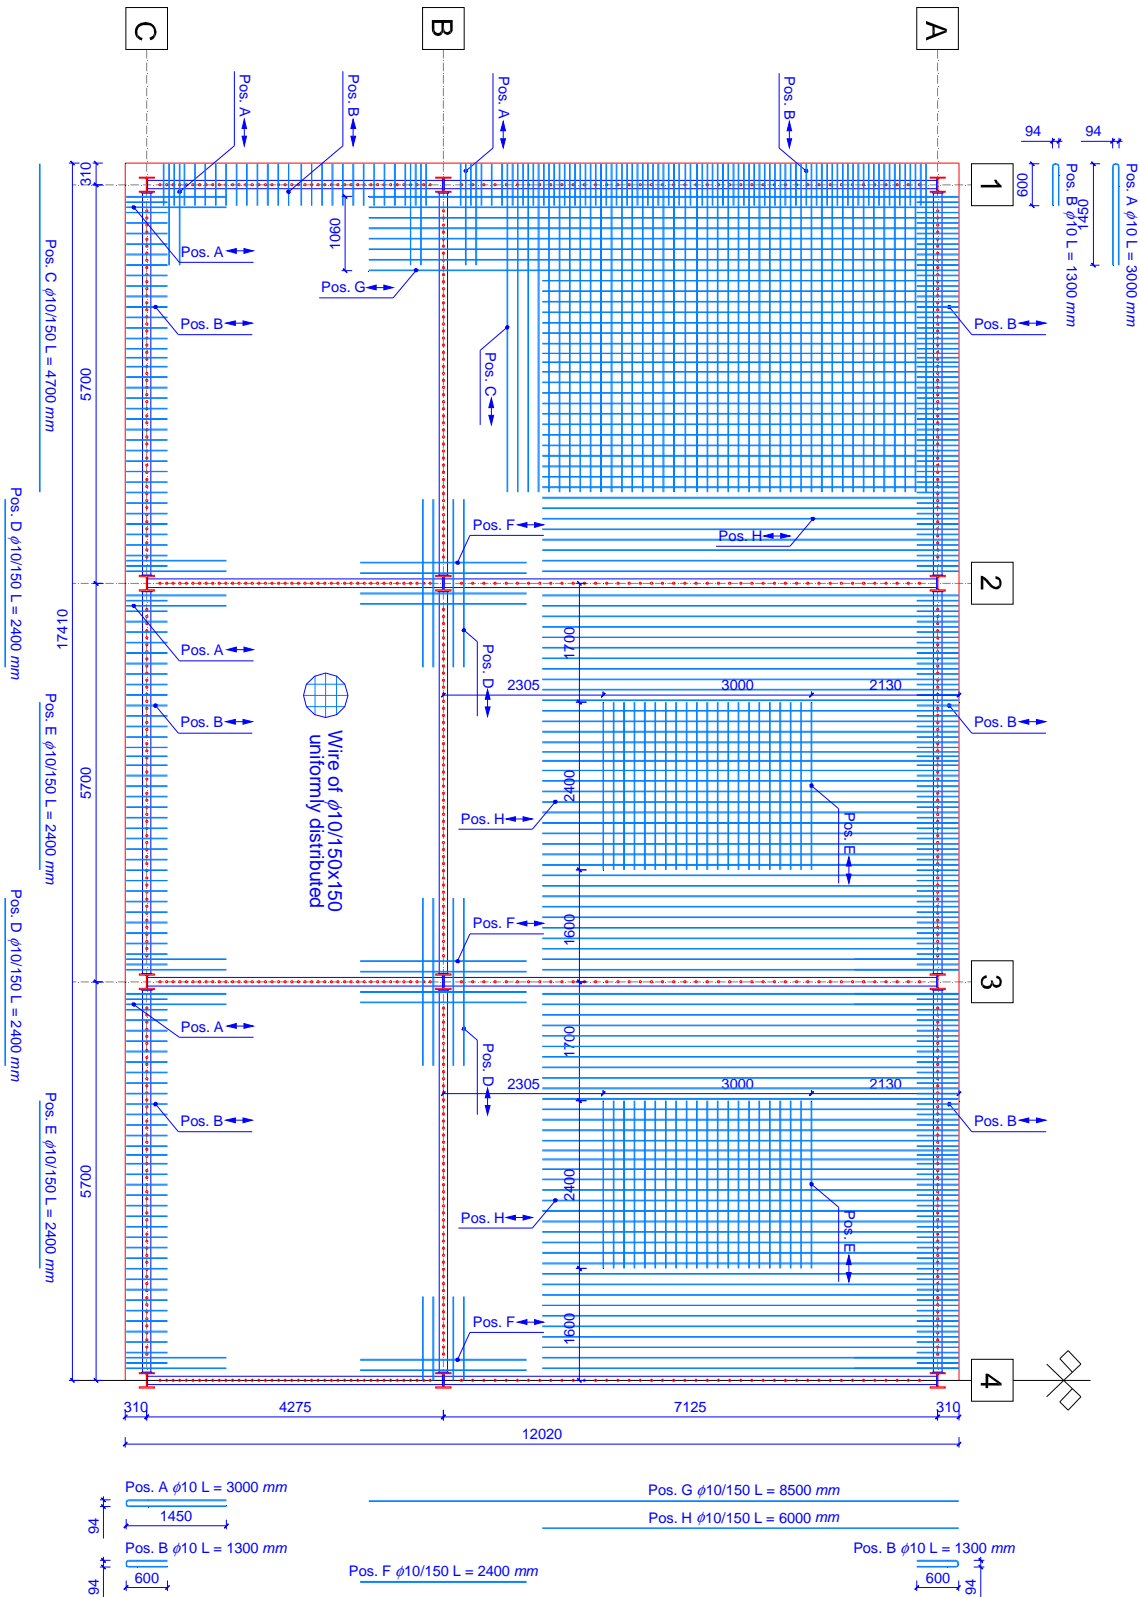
Slab Rebars - Lower Side – Asymmetric Configuration (length unit mm)
